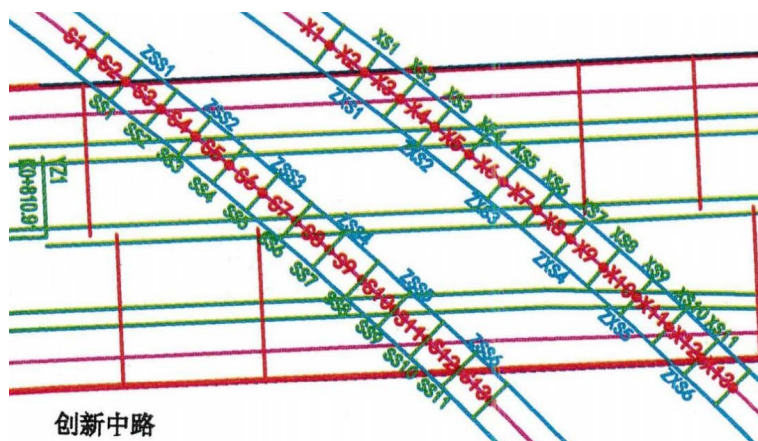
Layout of monitoring points for the deformation of tunnel structure
